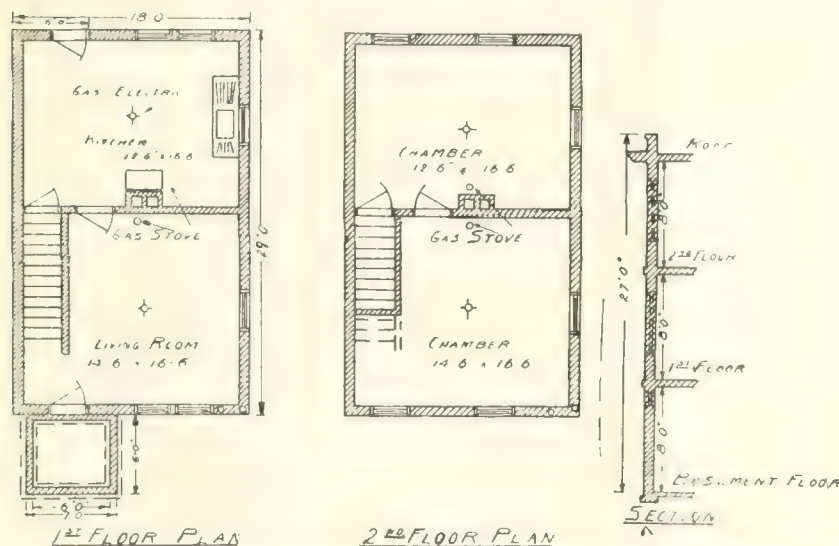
Sketches showing essential arrangements of low cost concrete houses.
